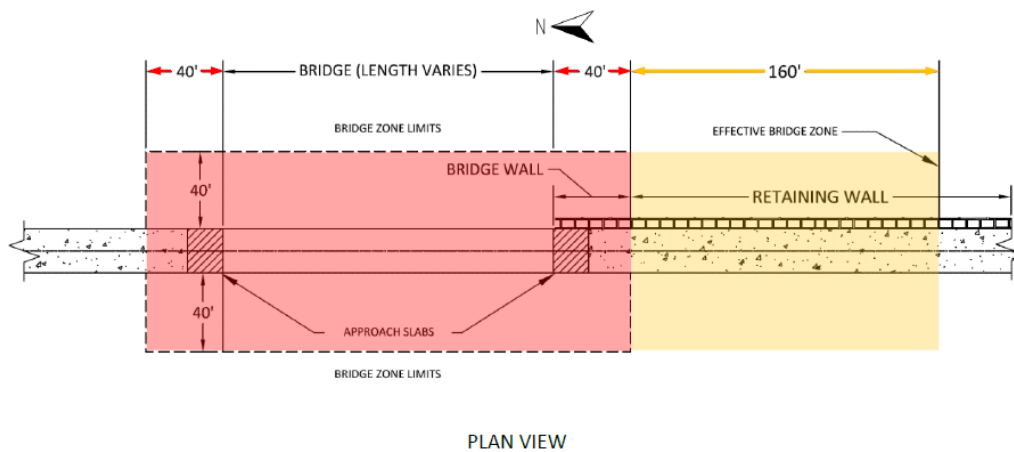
Separation of wall at bridge zone (from Walters et al. 2016)
